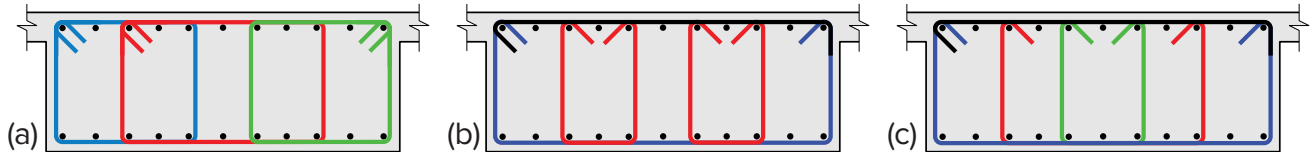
Potential multi-leg stirrup configurations for a wide beam: (a) multiple closed stirrups across the width of a beam (not constructable); (b) an open-top perimeter stirrup with nested internal open-top stirrups; and (c) an open-top perimeter stirrup with two internal open-top stirrups. Detail (c) is preferred, as Details (a) and (b) will require stacking of three stirrups and can cause congestion.
